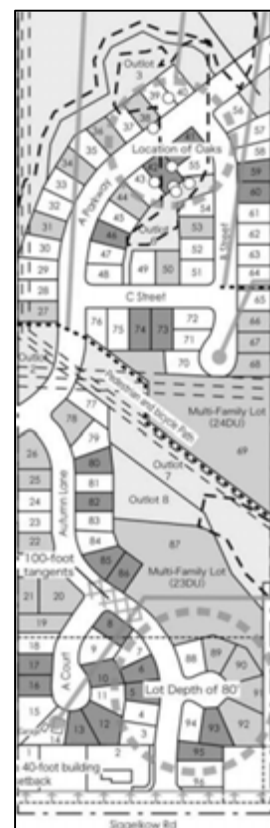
Site Plan for the Twin Oaks Subdivision in Madison, WI.
